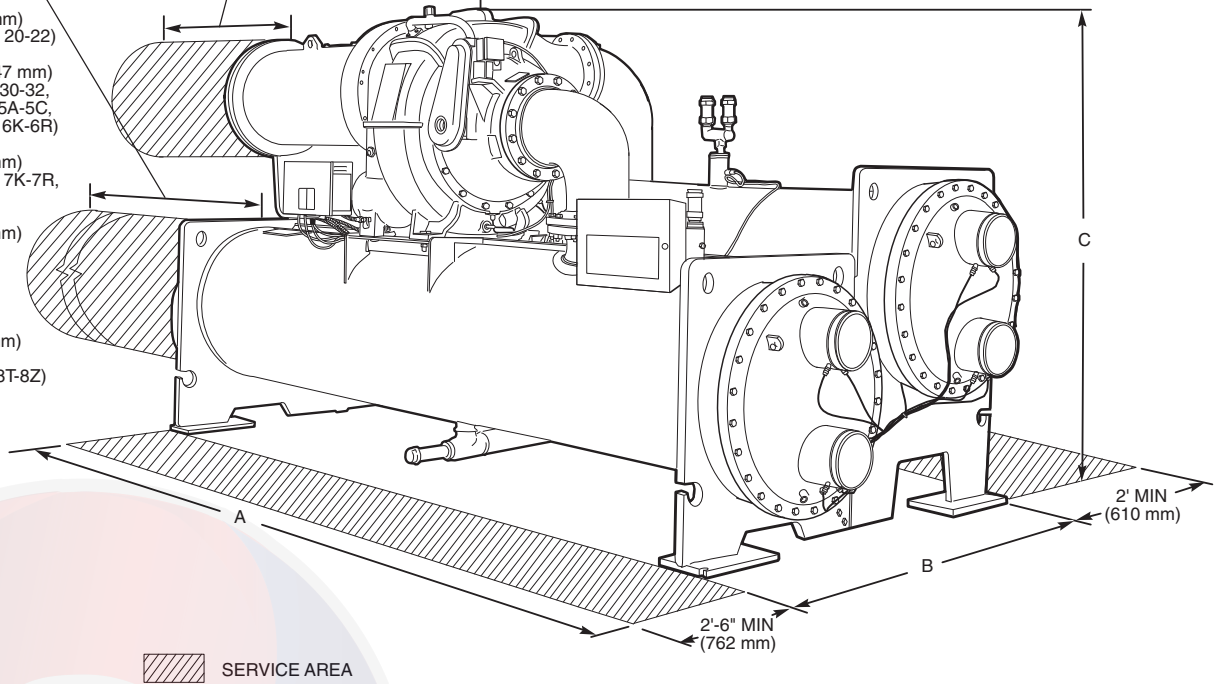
19XR Dimensions (Refer to Tables 1 Through 3)
